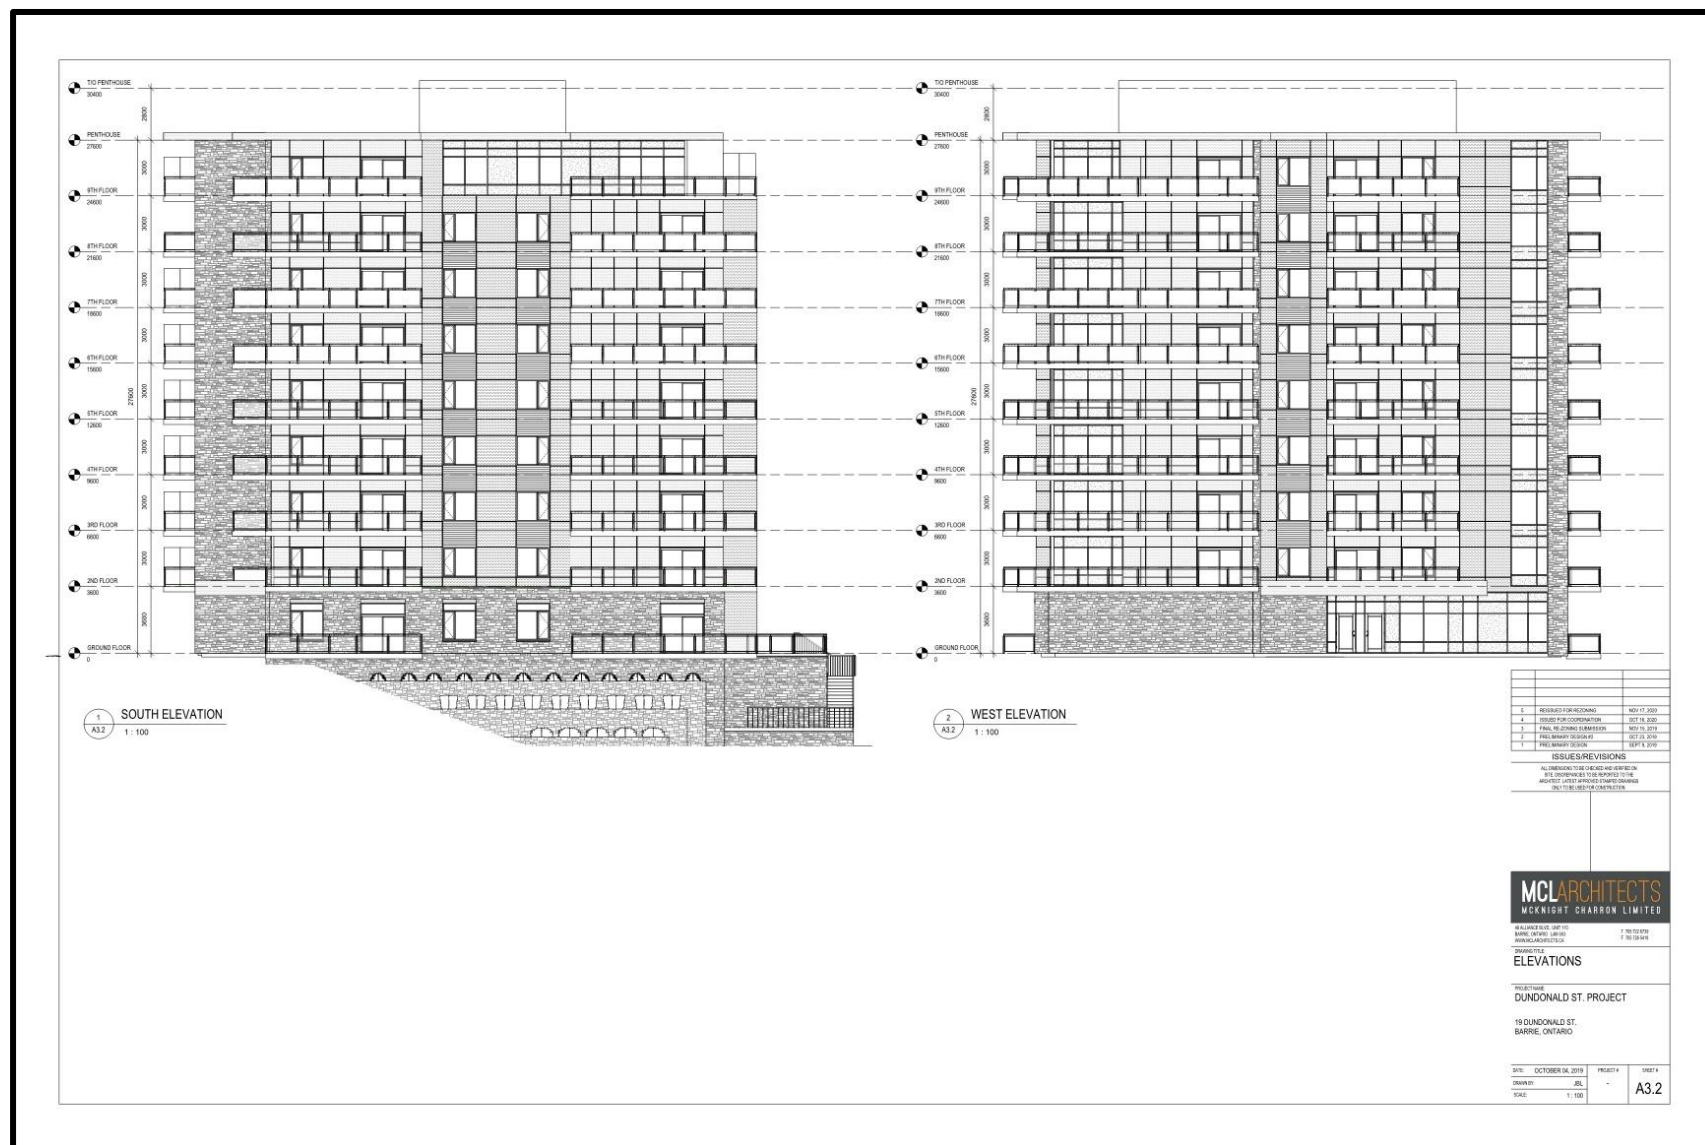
Alternative Option 2: Nine-Storey Proposed Development – South and West Elevations
